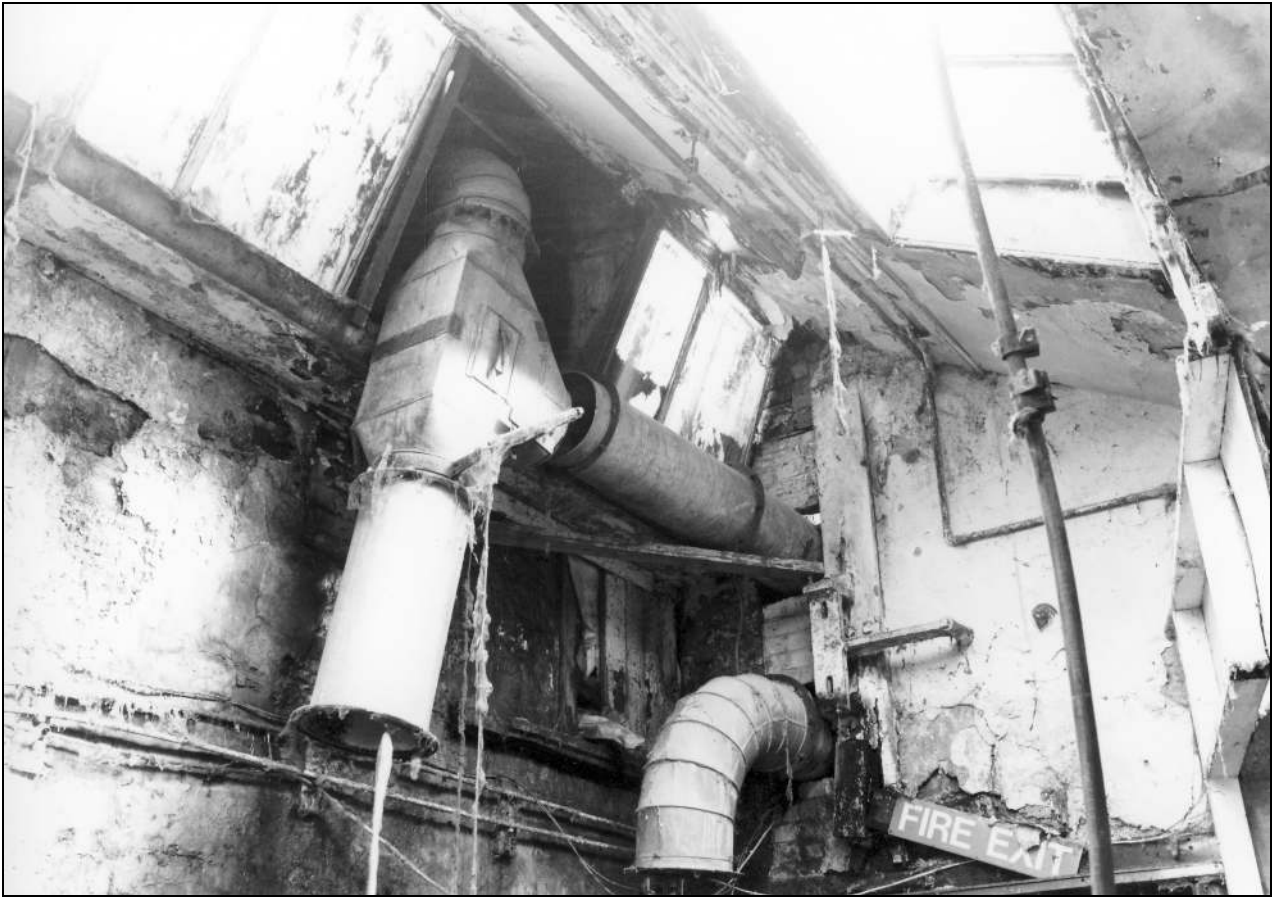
North-east corner of weaving shed, showing arrangement with engine house (film 7, frame 15)
